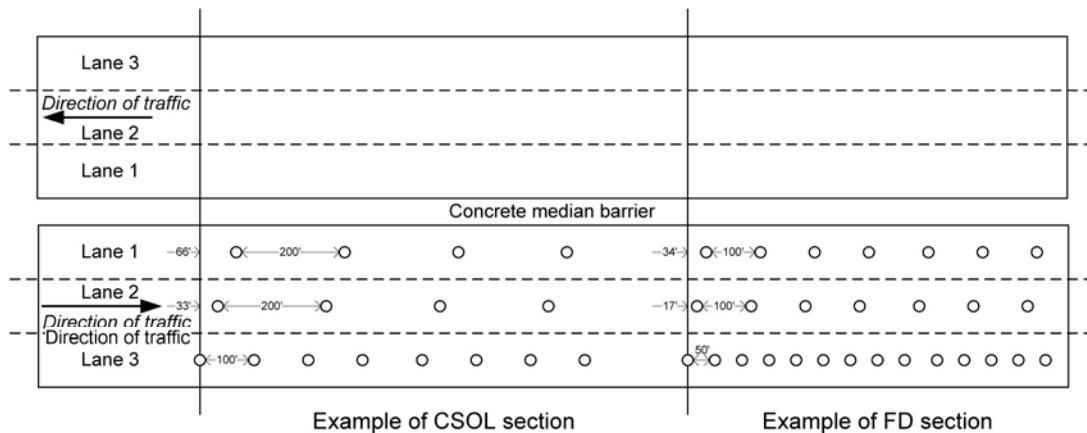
Deflection testing patterns for crack, seat, and overlay (CSOL) and full-depth asphalt concrete sections.
